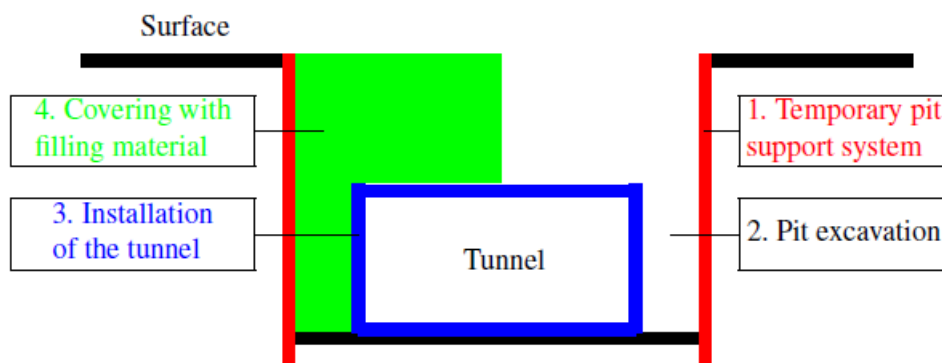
Installation of a tunnel at the bottom of a construction pit.
